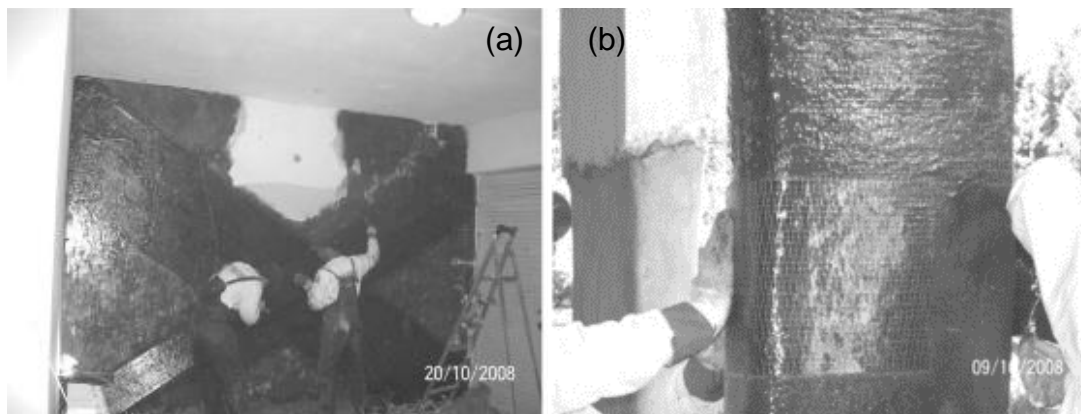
CFRP application to the masonry infill walls (a) and columns (b) (Tan, 2009).
